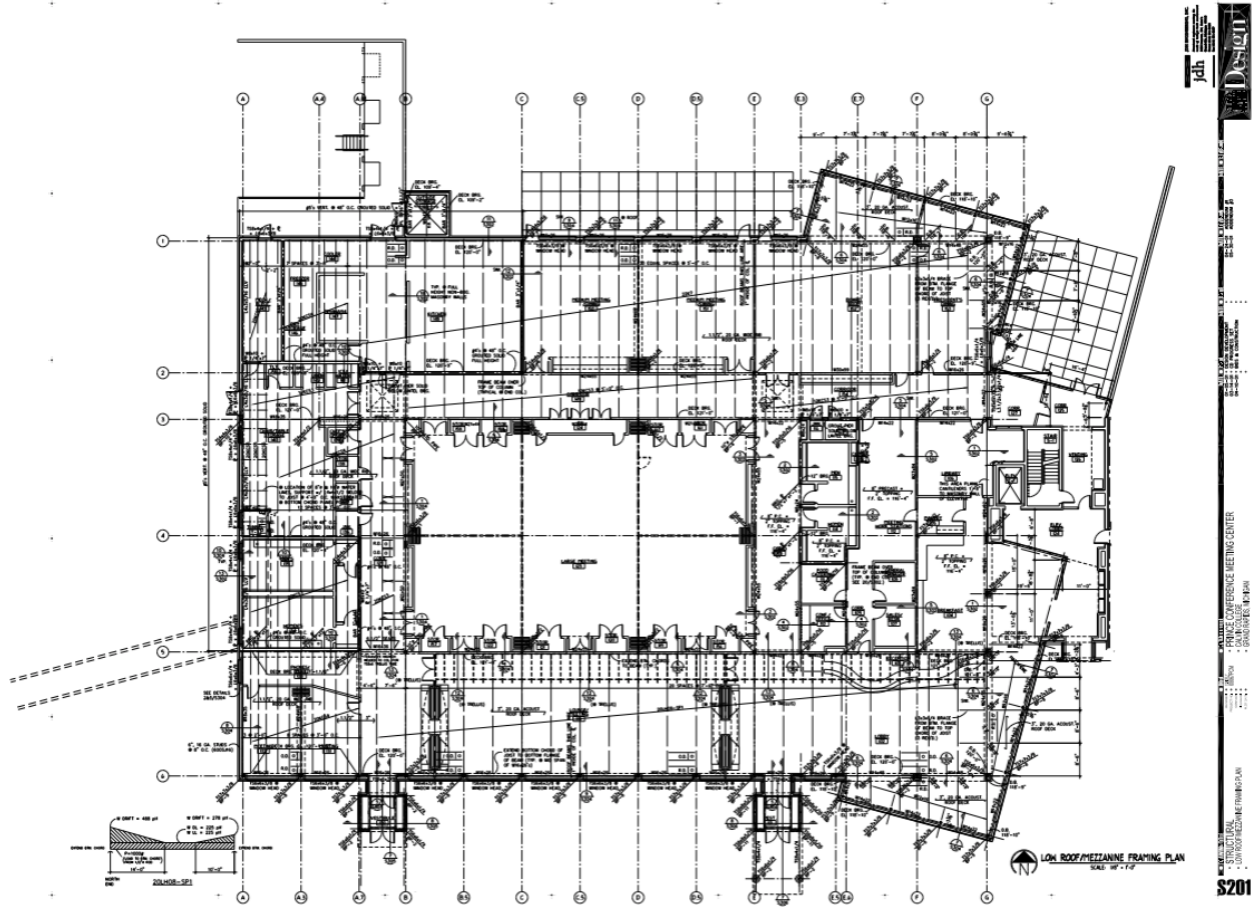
Prince Conference Center Roof 1 Framing Plan.
